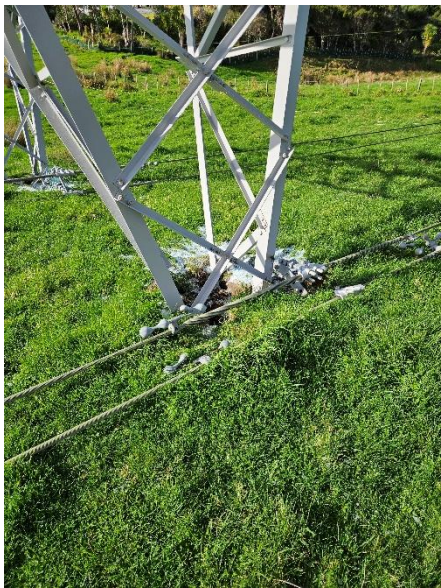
Tower crossarm embedded in the ground from tower fall.
